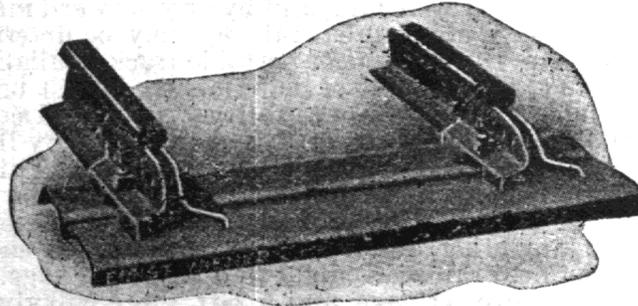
ANGLE PLATE CONNECTION WITHOUT BOLTING.
